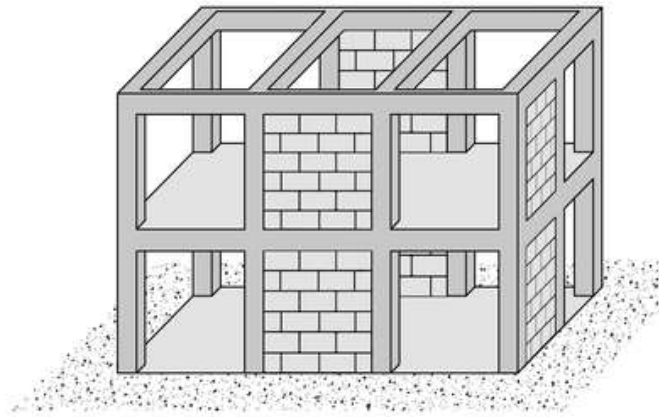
Masonry-infilled reinforced concrete frame (Image source: Openquake)
